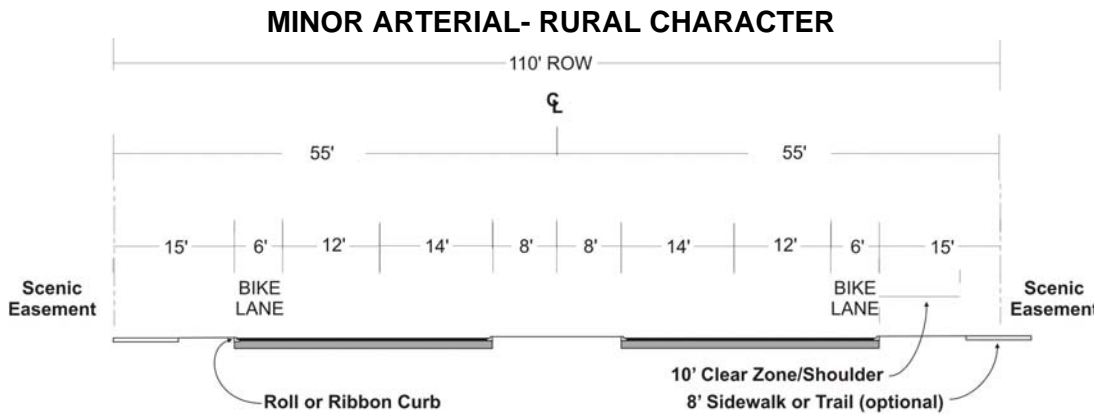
ROADWAY CROSS SECTIONS (Continued)
